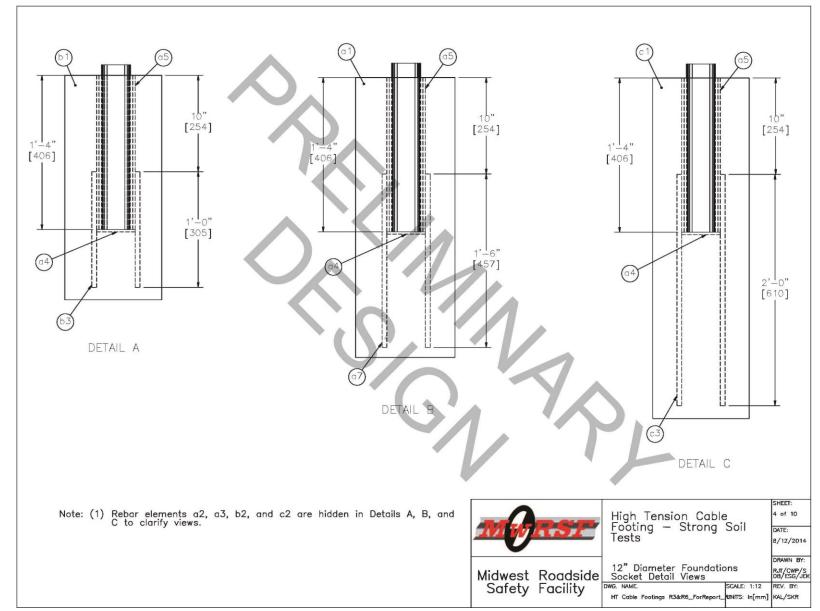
Reinforcement Details for 12-in. (305-mm) Diameter Foundations, Test Nos. HTCB-10 and HTCB-11
